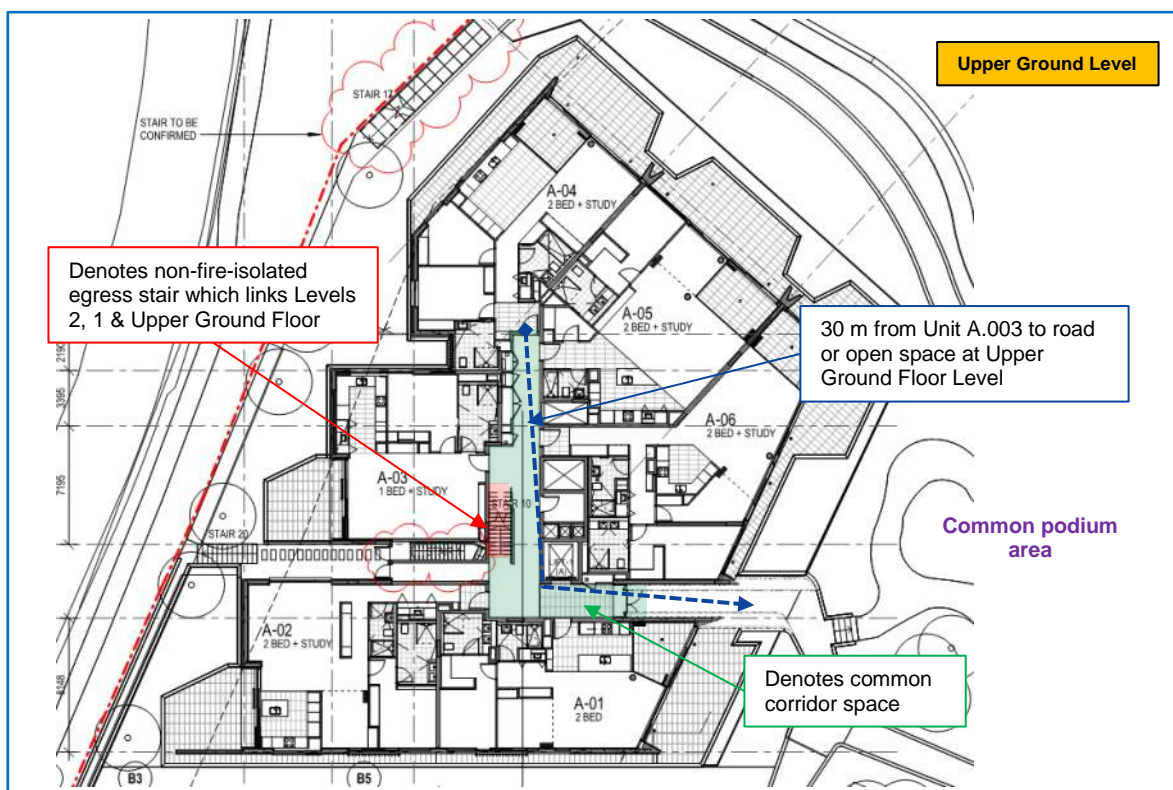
Building A Upper Ground Floor – egress by way of non-fire-isolated stairway (BCA D1.9(a))
